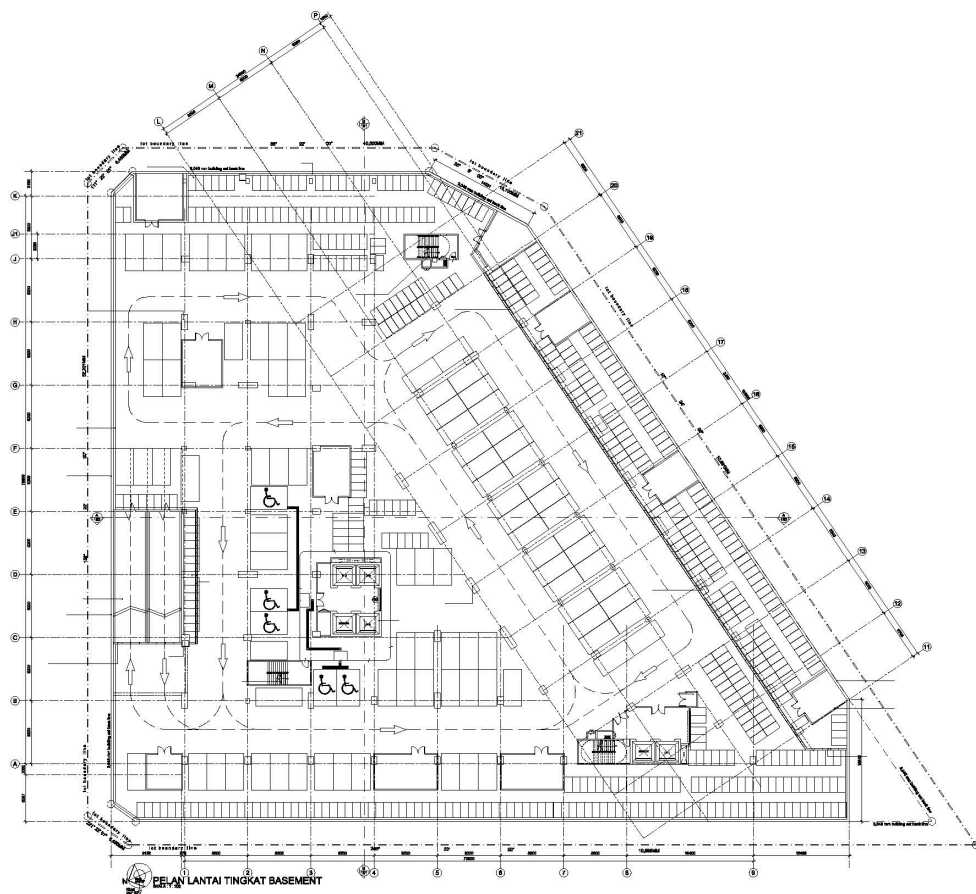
Layout drawing of the basement car park at UTAR block KB
